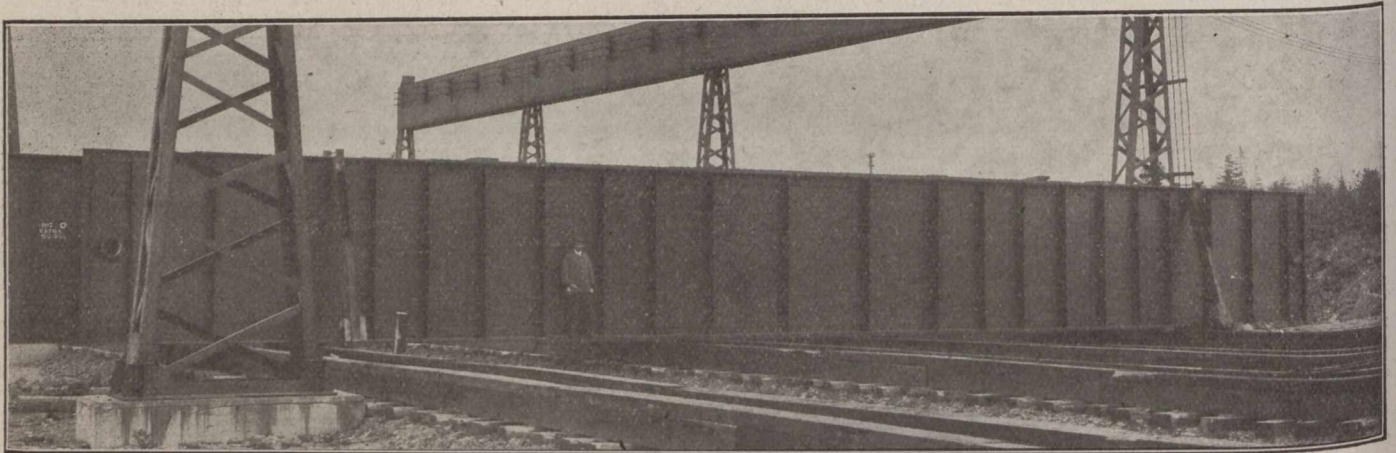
View showing one web of double floor beam at the bridge site storage yard. These girders are 10 ft. high and 88 ft. c. to c. 11-inch pins are used to connect the 60-ton floor beams to the post.
